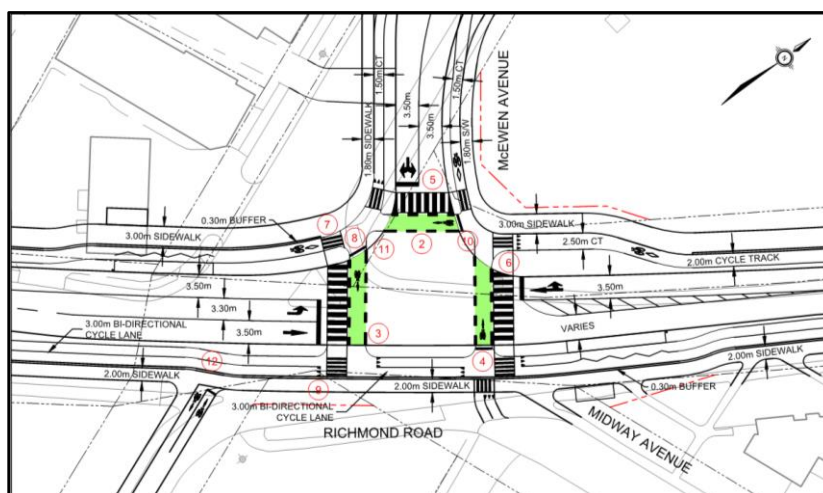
Richmond Road Complete Streets - McEwen Avenue Intersection
